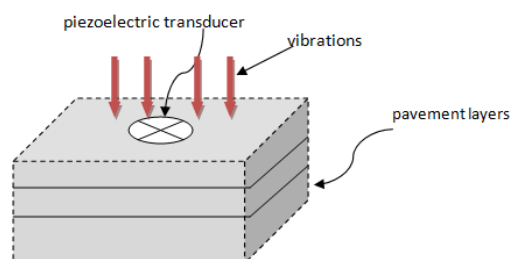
Schematic of piezoelectric transducers embedded in a pavement
